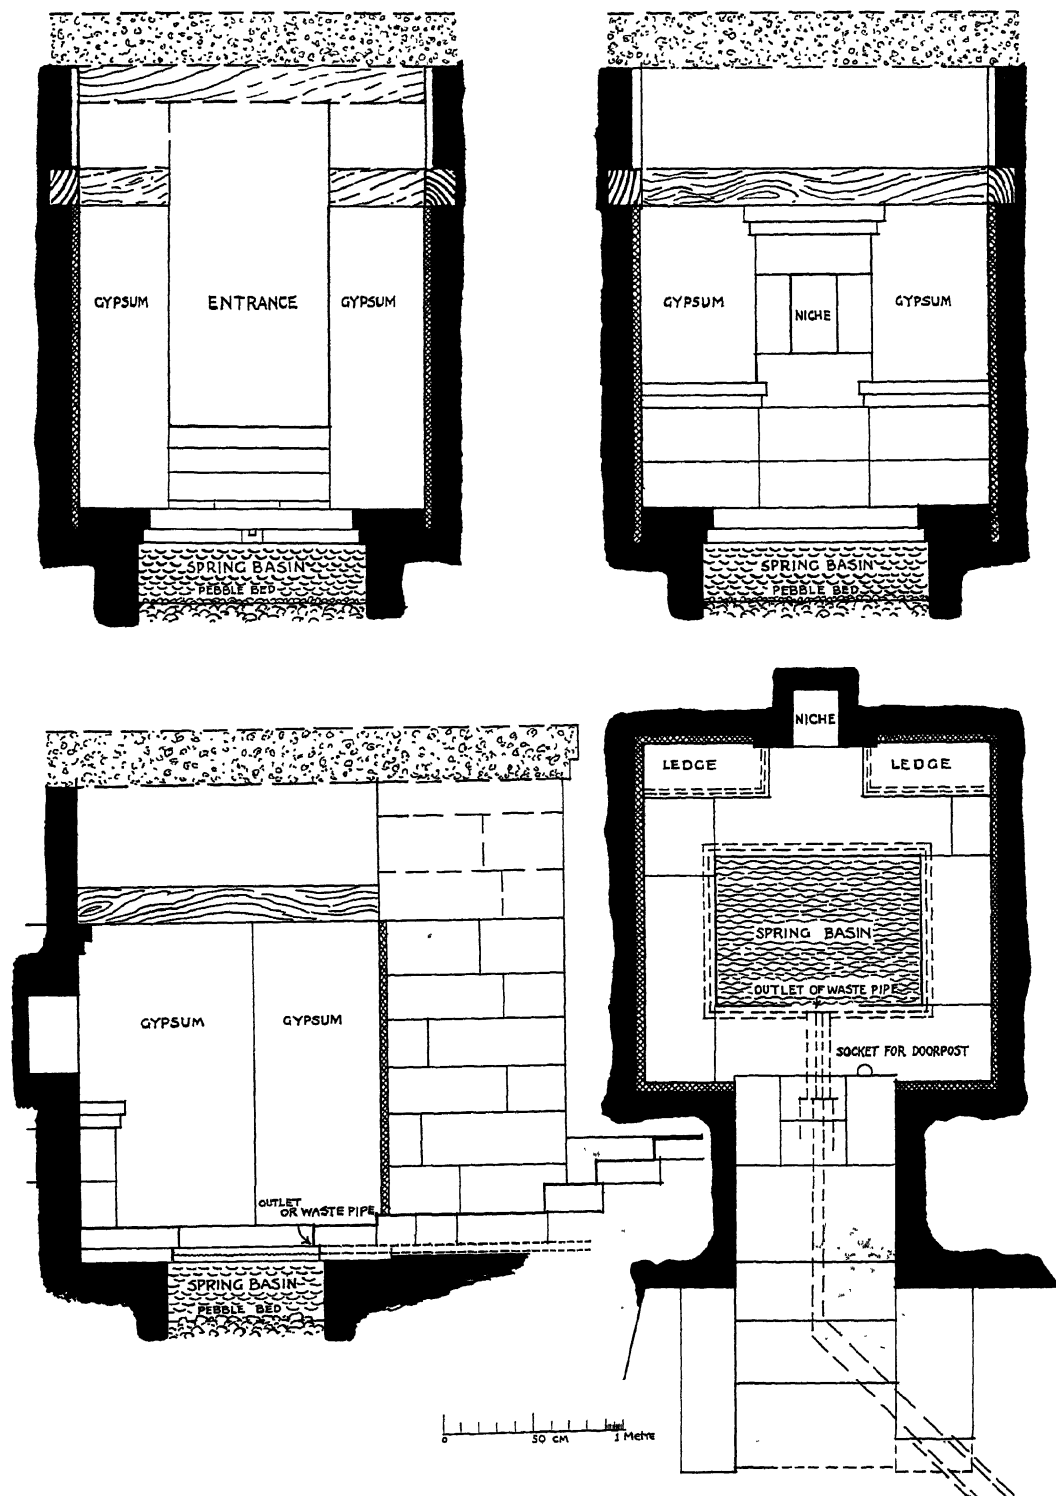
PLAN AND SECTION OF UNDERGROUND SPRING-CHAMBER.
